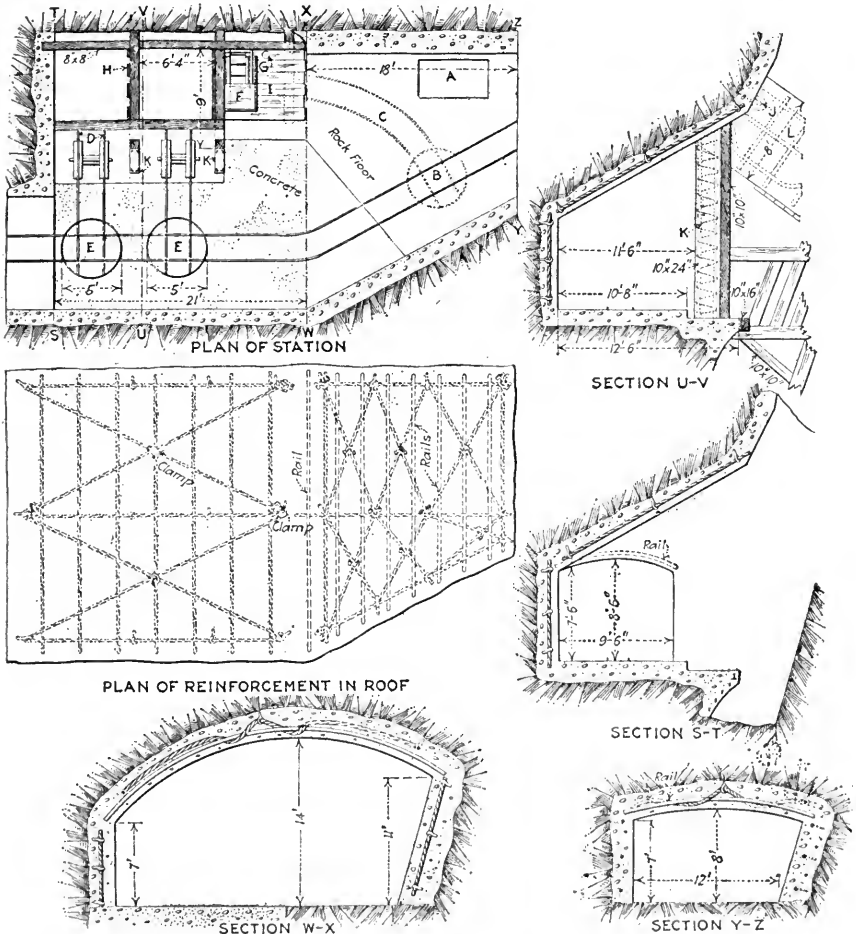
PLANS AND SECTIONS OF CHAMPION CONCRETE-LINED STATION.
